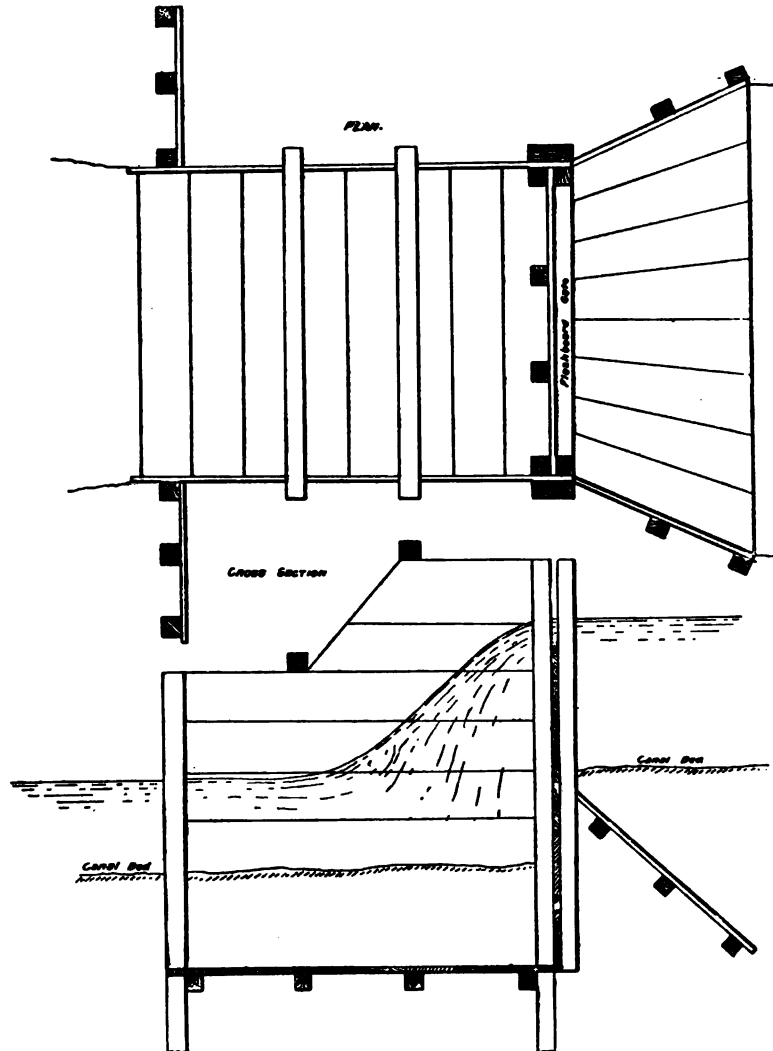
Fresno canal. Plan and cross sections of falls.
